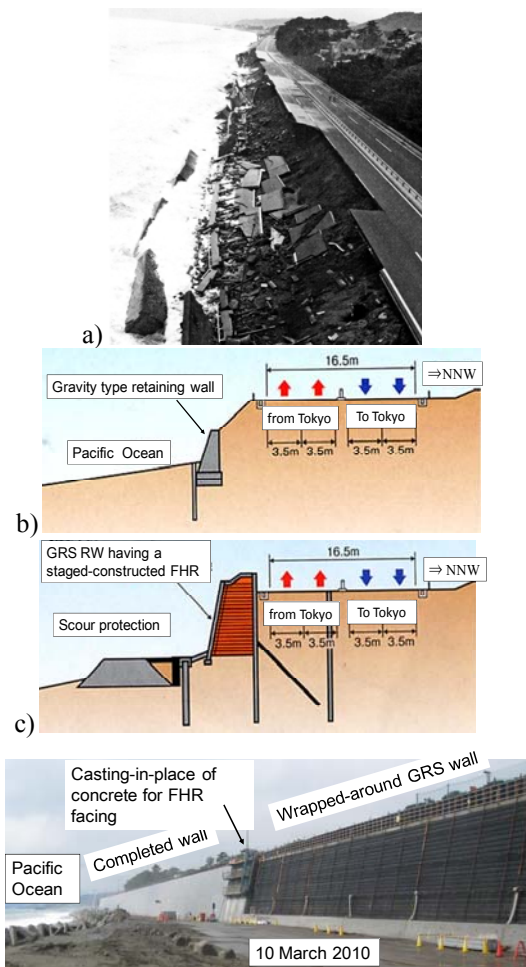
Seawall for Seisho by-pass of National Road No. 1, Kanagawa Prefecture, southwest of Tokyo: a) collapse for a length of more than 1 km by Typhoon No. 9, 29th Aug. 2007; b) original structure; c) reconstructed seawall; and d) the wall during construction (a, b & c: by the courtesy of the Ministry of Land, Infrastructure, Transport and Tourism, Japanese Government).
